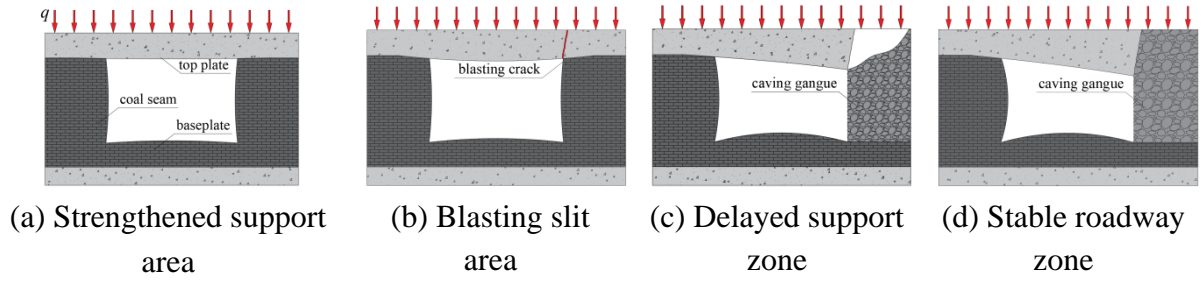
Roof structure in different stages of roof cutting pressure relief roadway retaining technology
